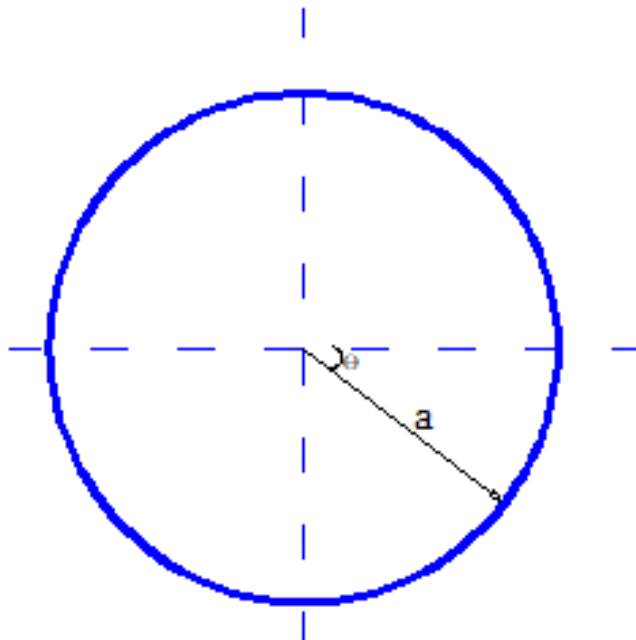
8: Spherical concrete shell subjected to wind load plan view
